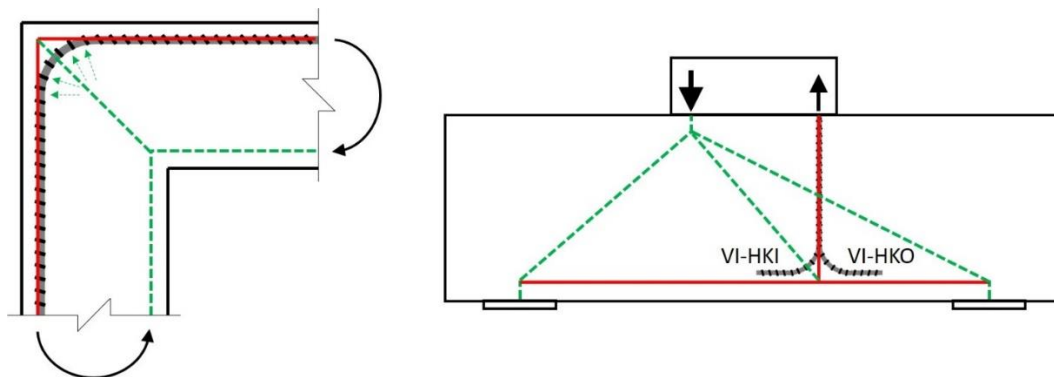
Typical hook orientation in a beam-column joint (left) and hook orientations planned for Phase II testing (right)
